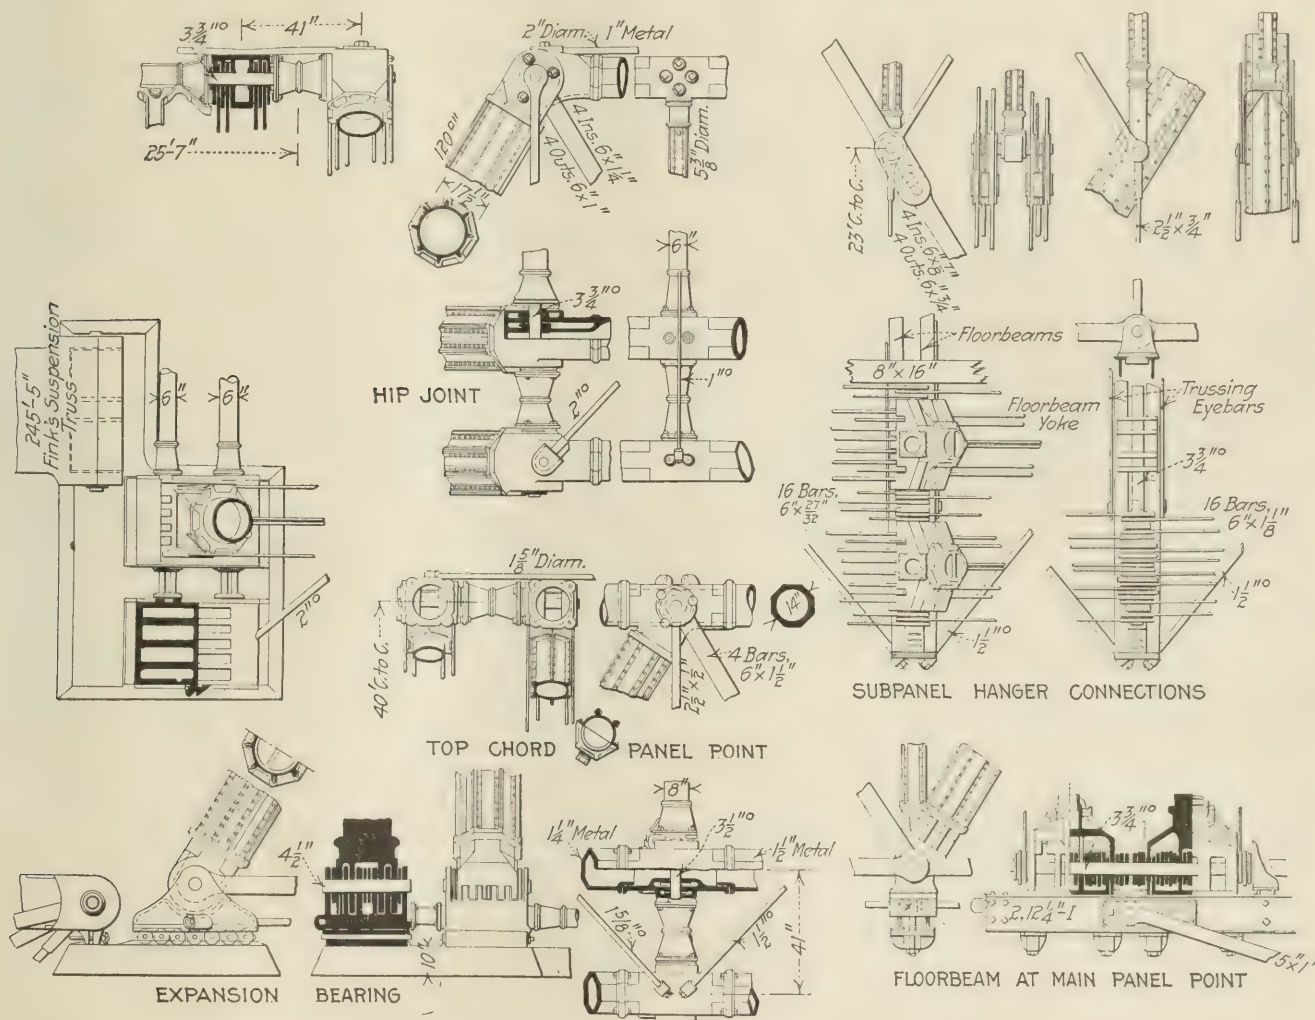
SOME TYPICAL DETAILS OF THE LARGE THROUGH SPAN
